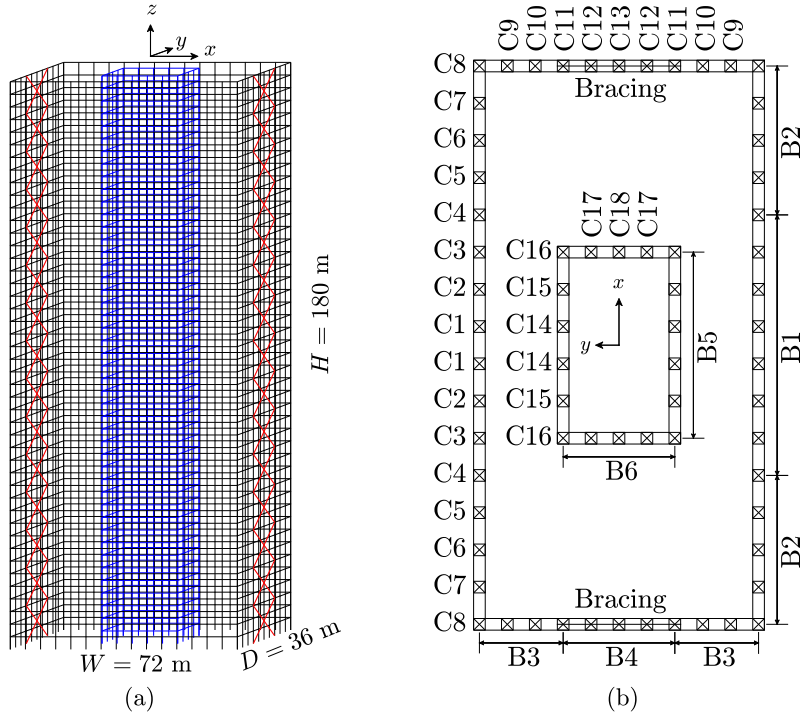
(a) 3D illustration of the structural system of the 45-story building; (b) Member layout for a typical floor (B = beam, C = Column).
